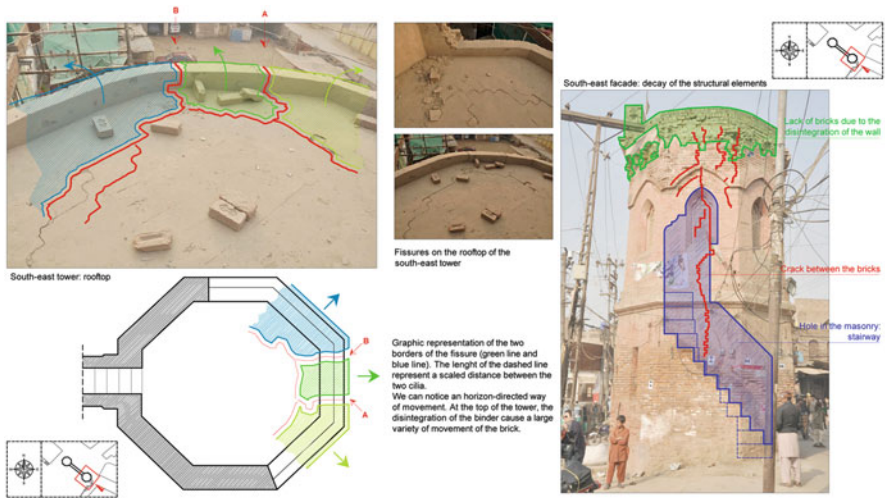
Survey of the structural decays: overturning of the walls and fissure nearby the stairs
